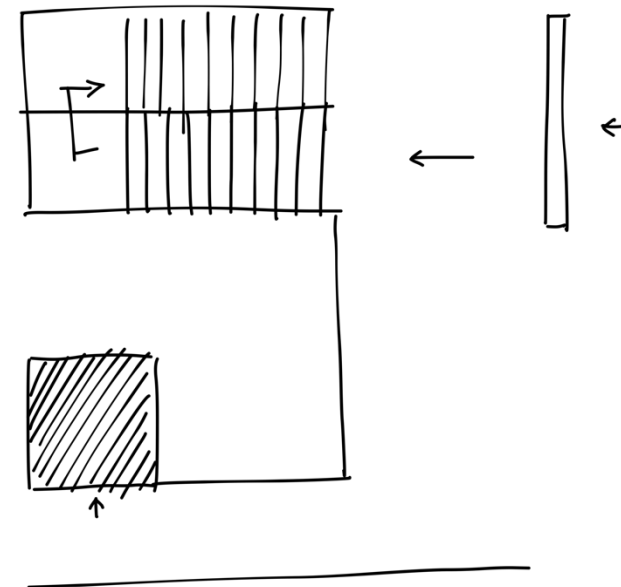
The Elevator is kept away from the staircase the natural instinct would be to approach the staircase at first.
